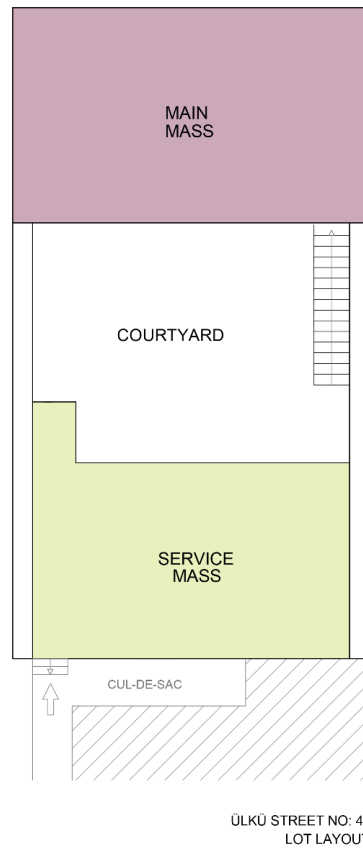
Lot layout of Ülkü-43 House (Author, 2023)
